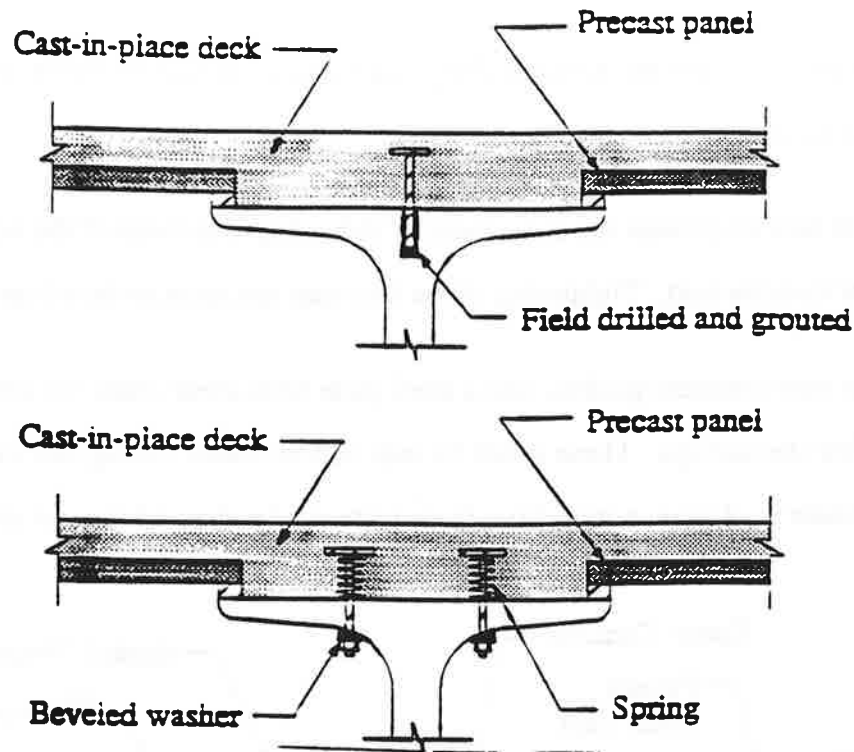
Suggested Details in Survey for Concrete Girder-Deck Joint for the Replacement of Existing Deck.
